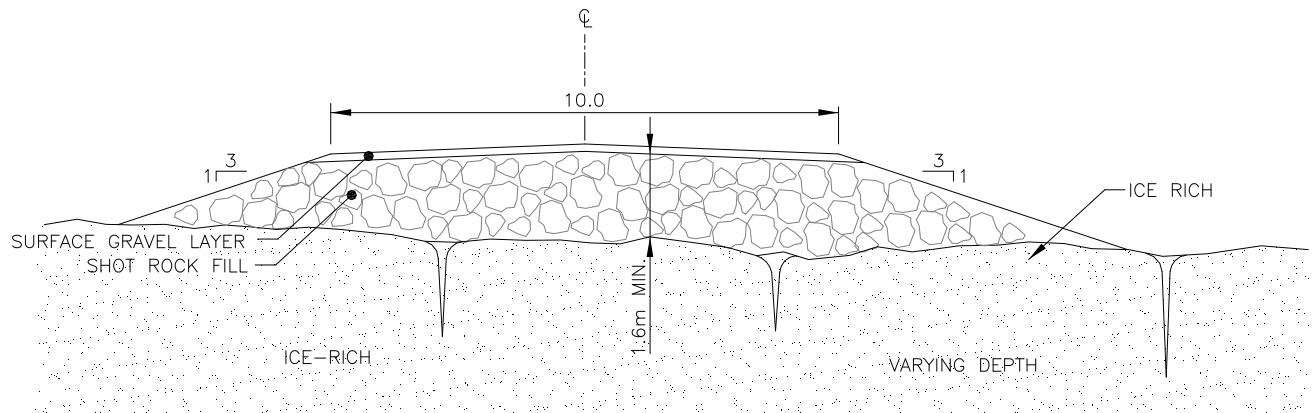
Typical Road Section on Organic and Wet Fine Grained Deposits (Terrain Type 3)
